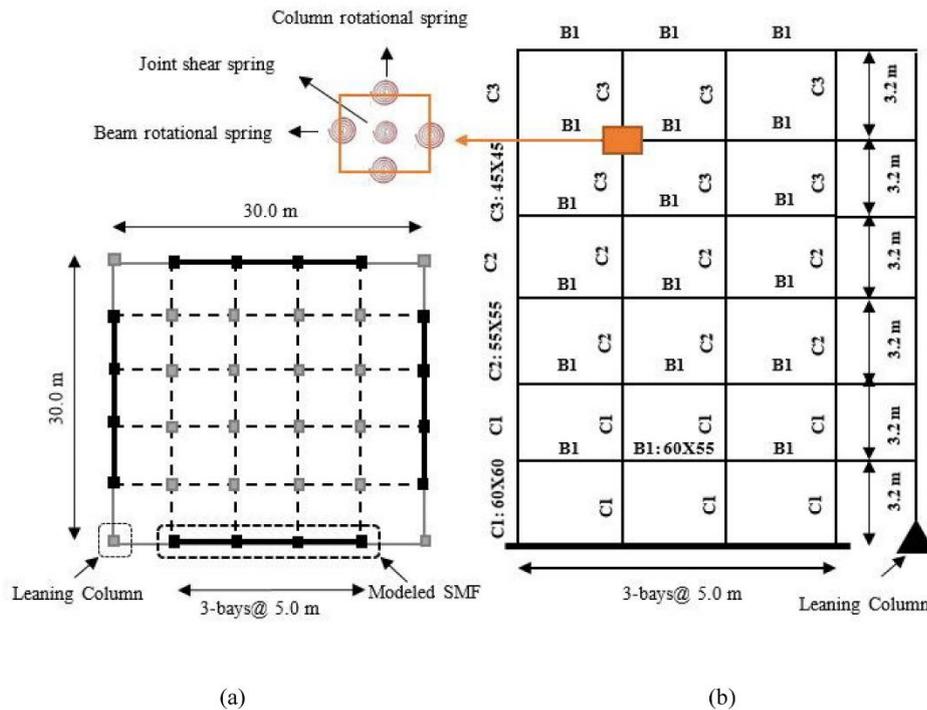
(a) Typical plan view of the concrete structure model and (b) Elevation of the six-story SMF
